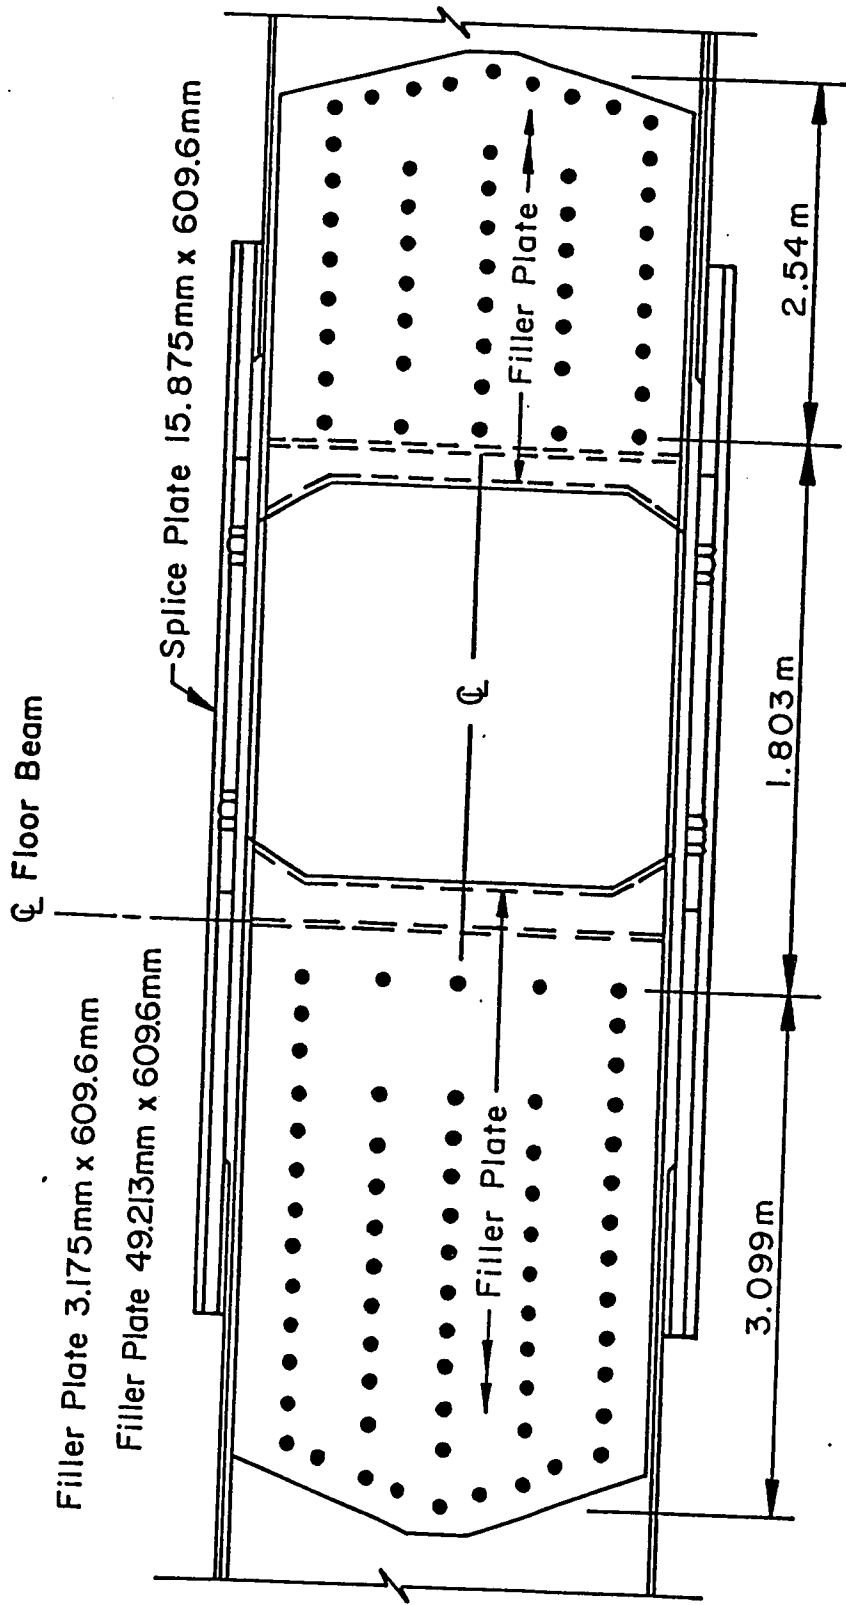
Elevation of the Typical Retrofit Detail for Spliced Panel Points of the Tie Girder
